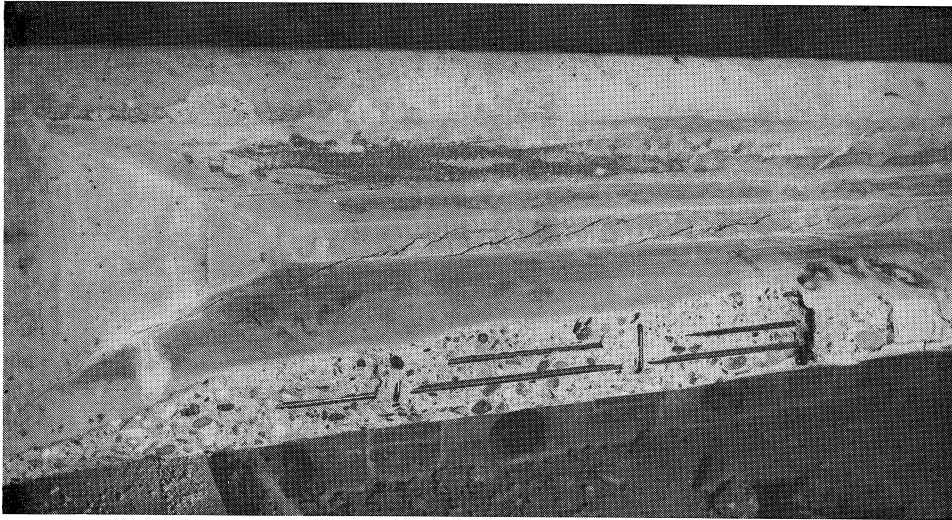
Typical cracking due to temperature gradient in the web of a model beam.
